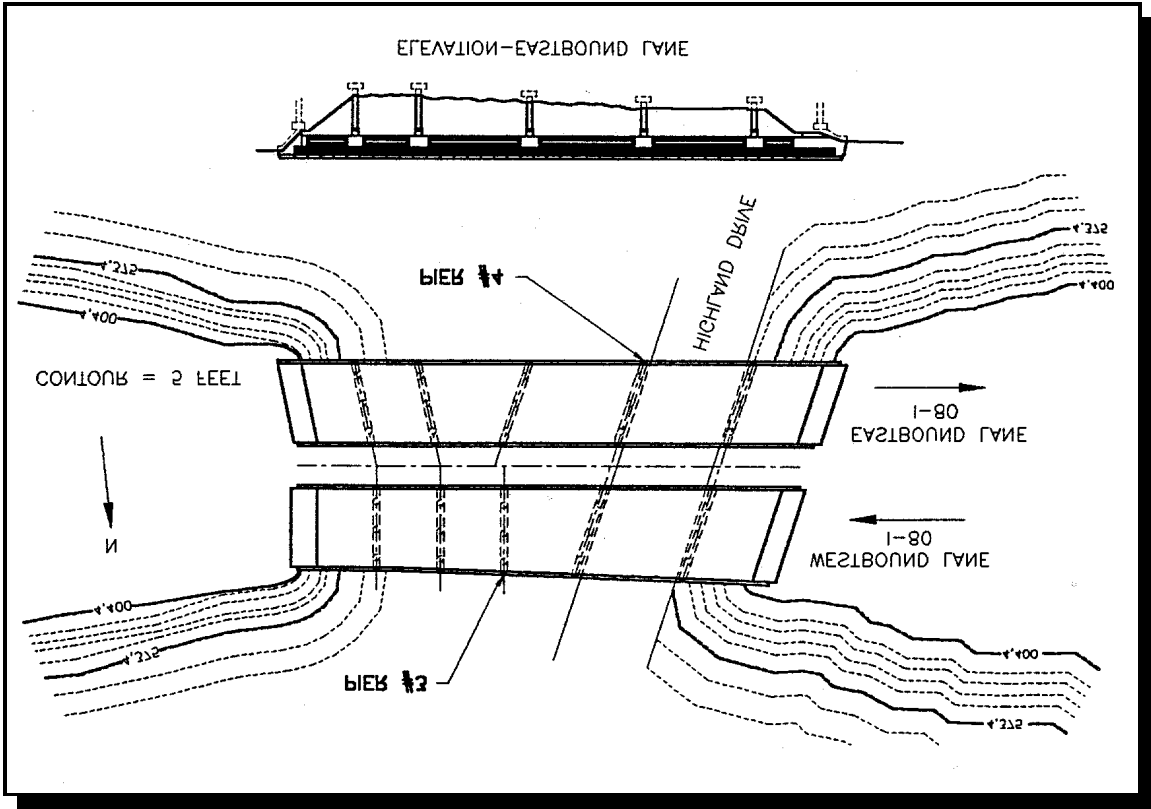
Plan and Elevation view of the Interstate 80 and Highland Drive overpass in Salt Lake City, Utah.
